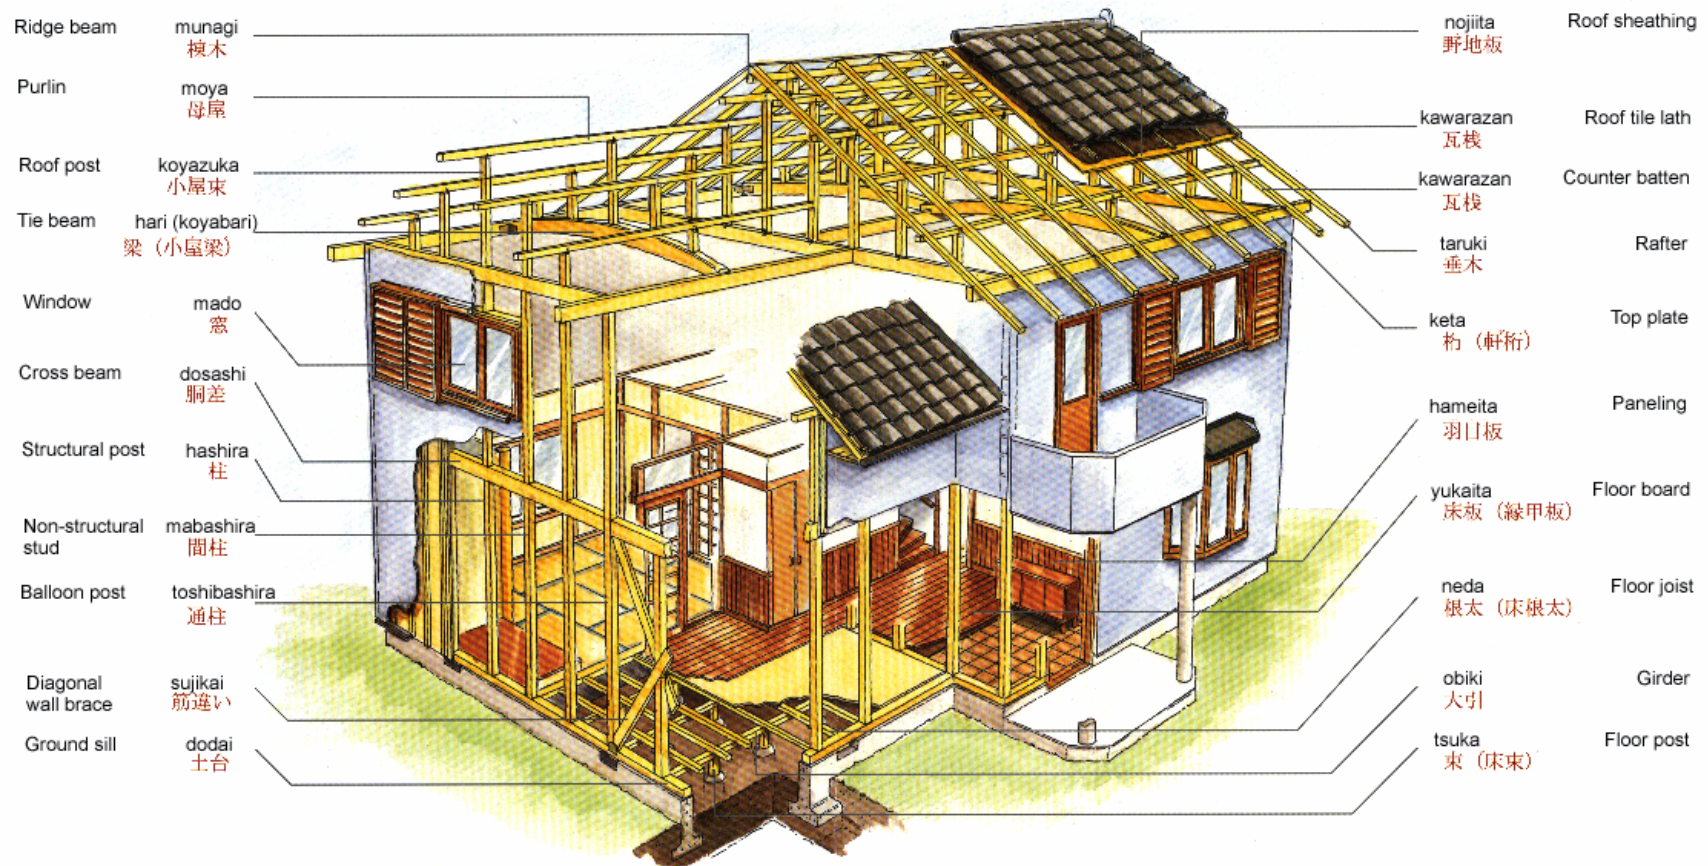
Illustration of structural components in a typical Japanese post and beam house.
